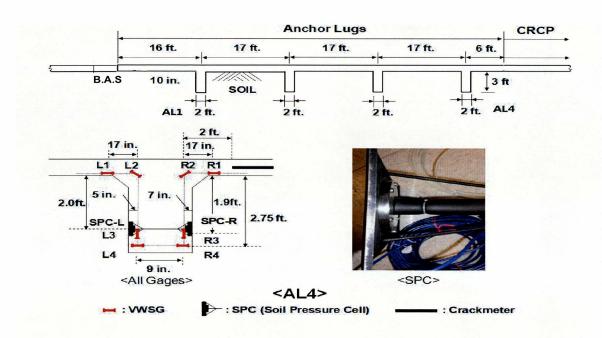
Section view of the anchor lugs, gages installation shown, jack out pressure cell
